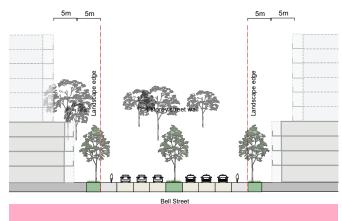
Bell Street, Bell Street Precinct. A 5m ground floor setback is proposed to manage amenity on this major road.
